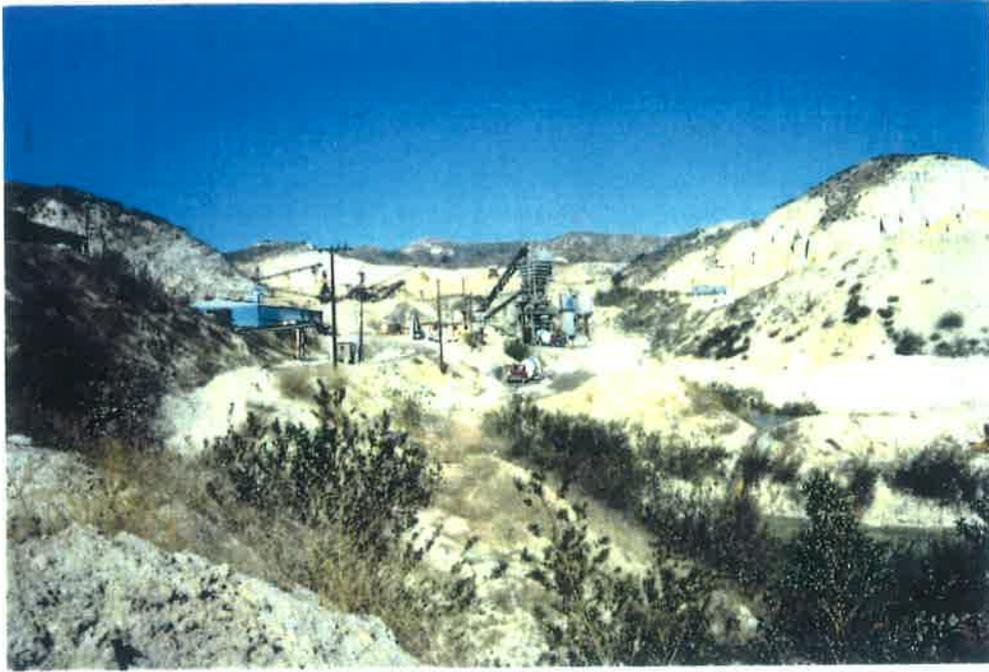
View of concrete batch plant from eastern end of project site, at the mouth of the canyon.
